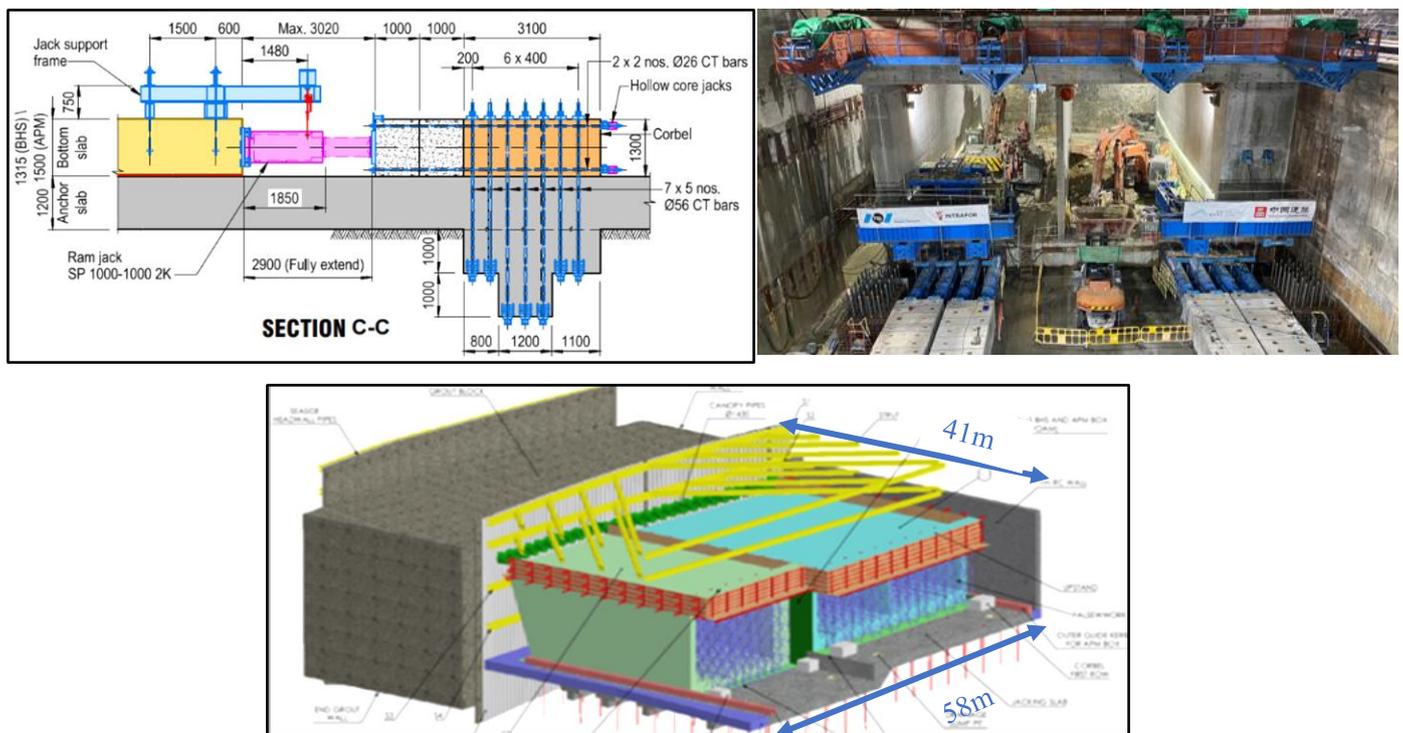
Construction of APM and BHS Tunnel Boxes in Jacking Shaft on top of Jacking Slab
